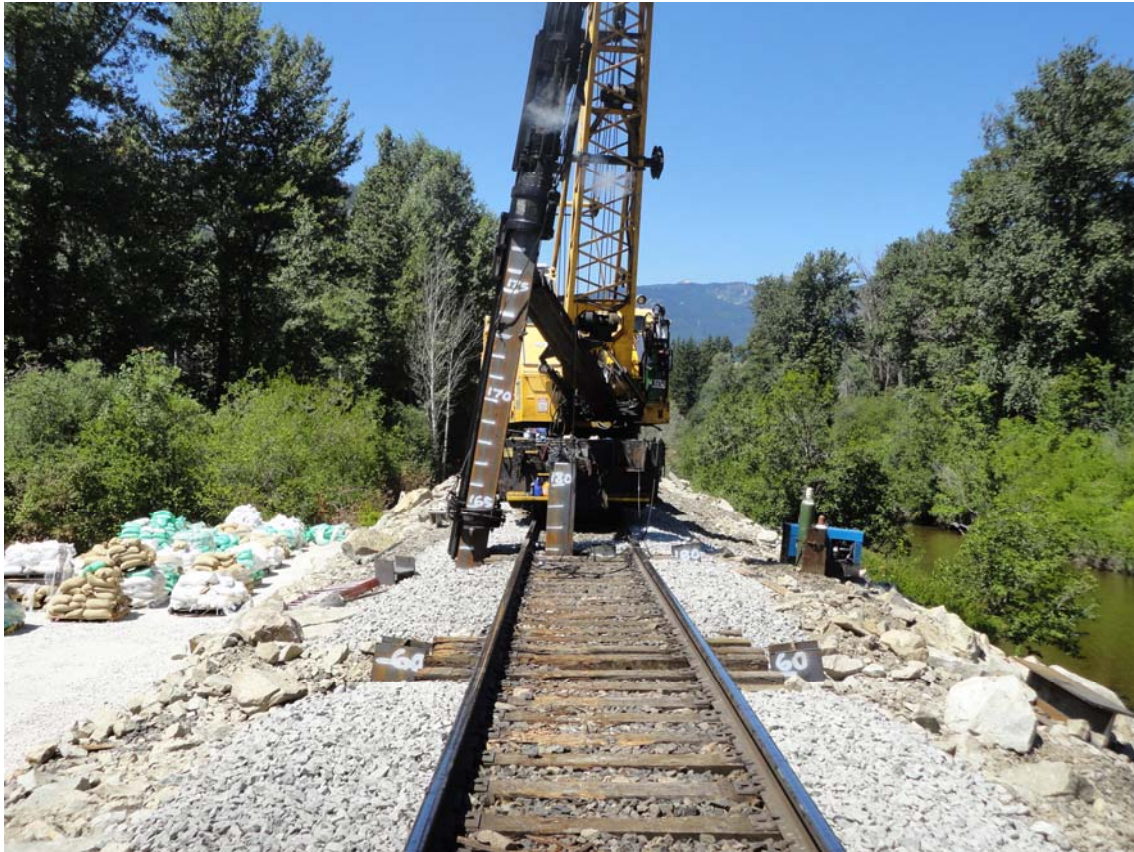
View of Bent 2 Pile 1 Segment 3 being advanced. The adjacent Bent 2 Pile 2 is still extending above the ground. BNSF used their follower to later finish advancing both piles.
